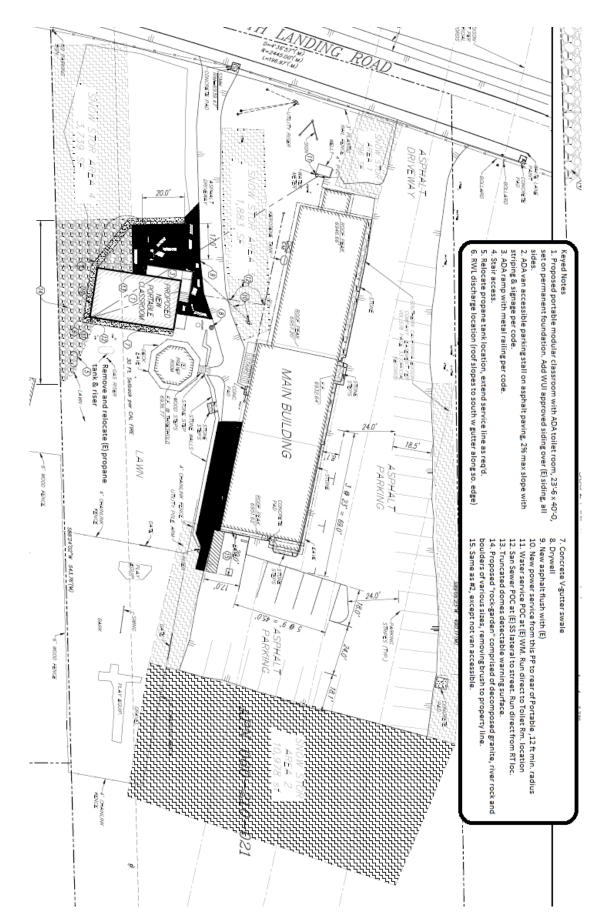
Site Plan showing entire parcel, including the main building (where an assembly room, offices, and four classrooms are found), as well as the detached prayer room and proposed new modular classroom.
